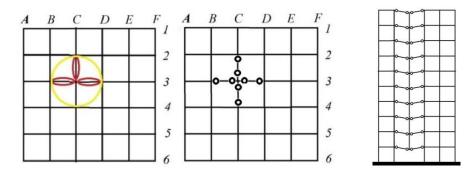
The schematic view of local collapse and creation of plastic hinges in structural plan and height
